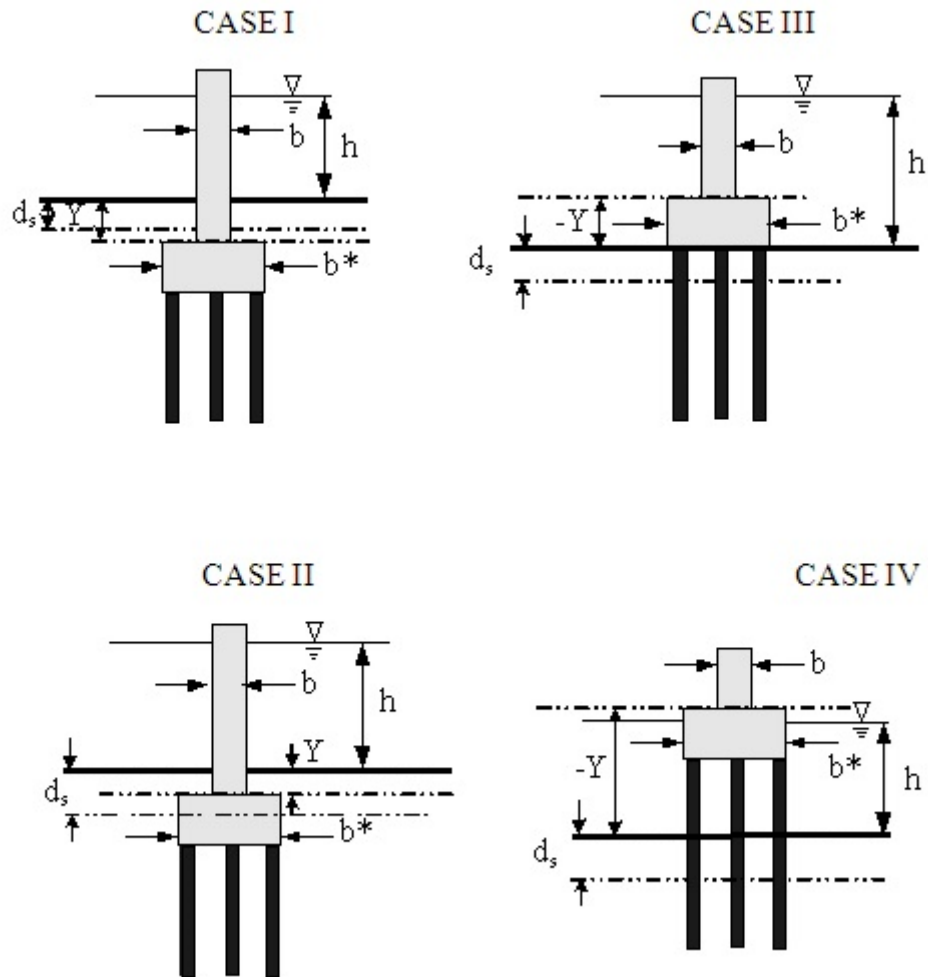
Potential local scouring with non-uniform pier shapes (IWFM, 2013)
